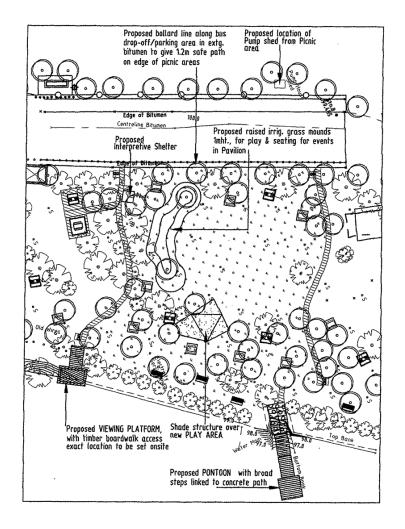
PLAN OF THE CENTRAL PICNIC AREA
